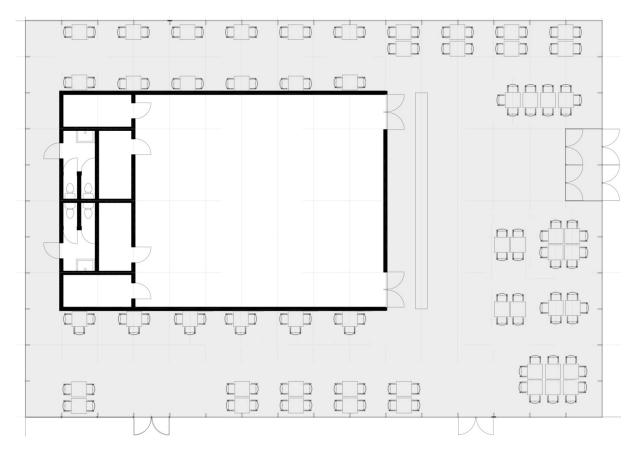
Floorplan of the restaurant with a redesign of the seating arrangement
